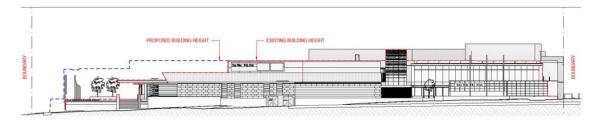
outline of proposed facade on the western elevation (Source: Altis Architecture)
